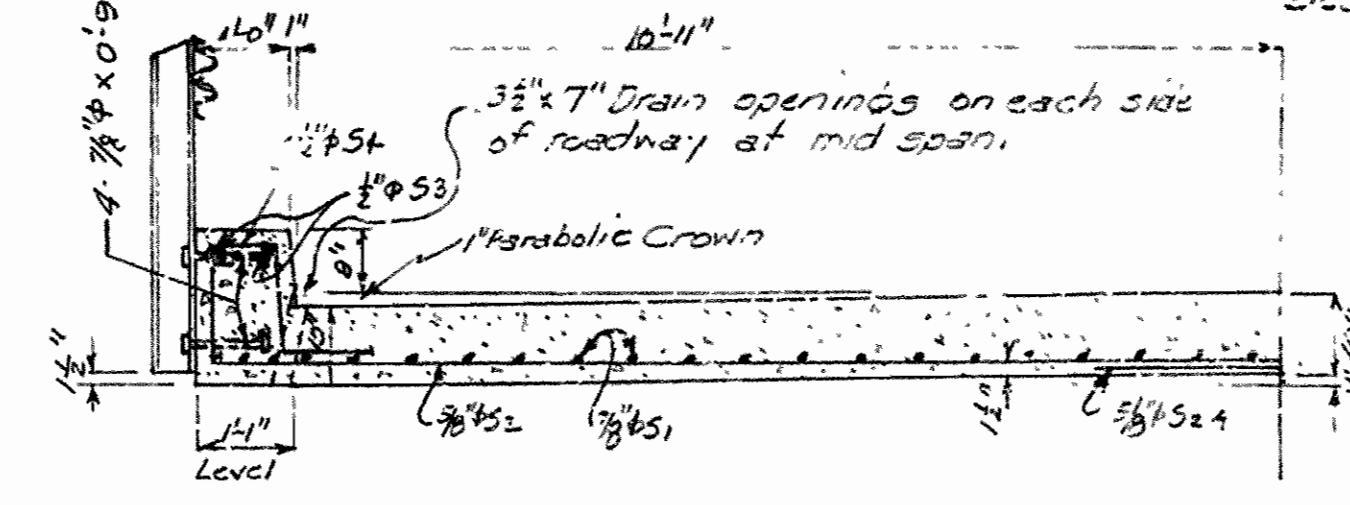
DETAILS OF SUBSTRUCTURE BRIDGES 4064 & 4068
